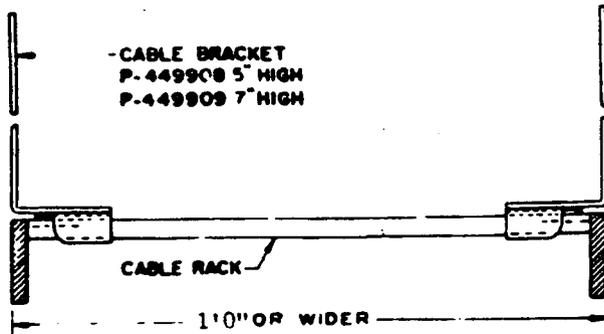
SINGLE CABLE RETAINING BRACKETS ON CROSS STRAPS (PARS. 3.11, 3.13)
